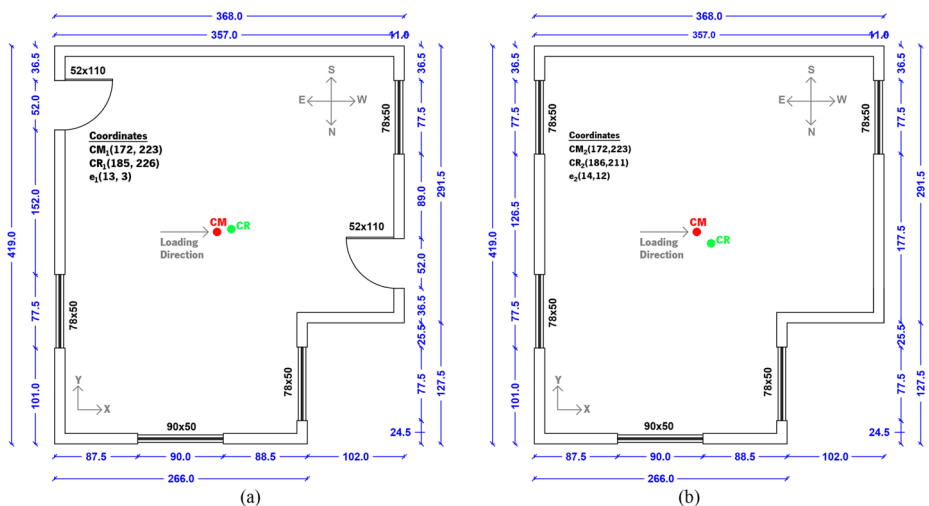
Plan dimensions of the experimental building: (a) first floor, (b) second floor (Units are in cm)
